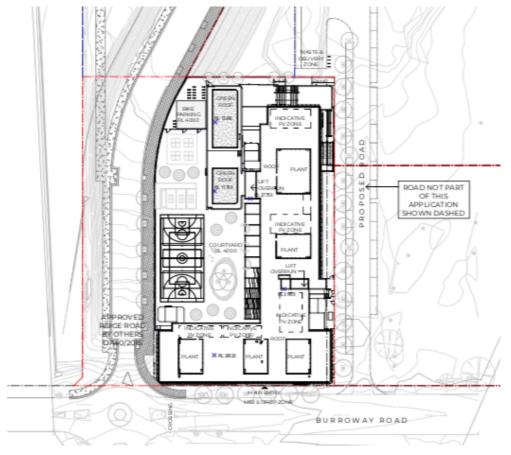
Updated site plan (based on roof plan) *Source: Woods Bagot
